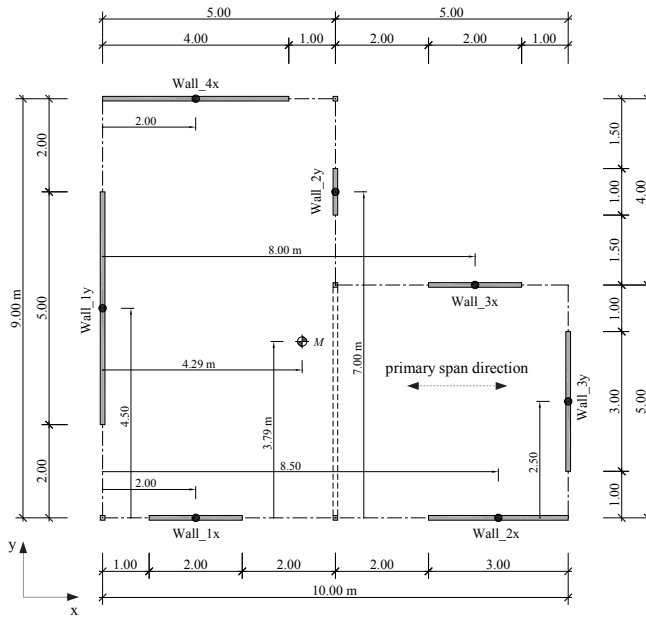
floor plan of investigated single-storey structure (assuming an equal distribution of gravity loads, the centre of mass (M) is set equal to the centre of floor area)
